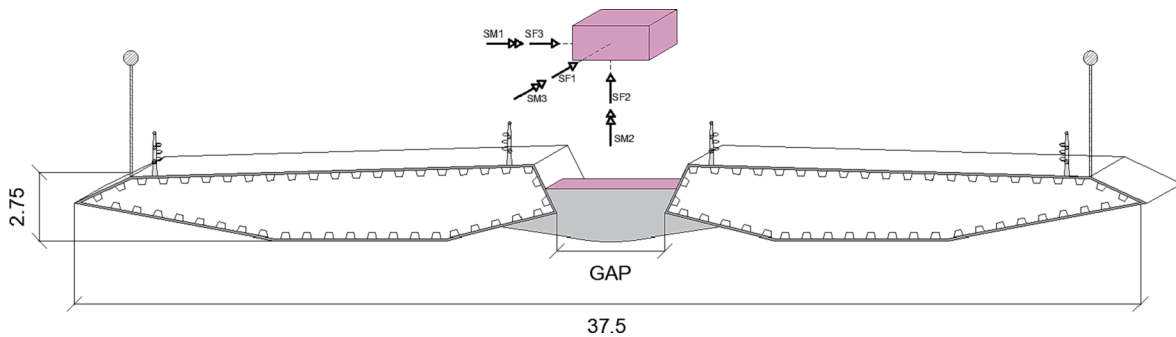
Twin deck cross-section of the Sulafjord Bridge (units are in metres).
